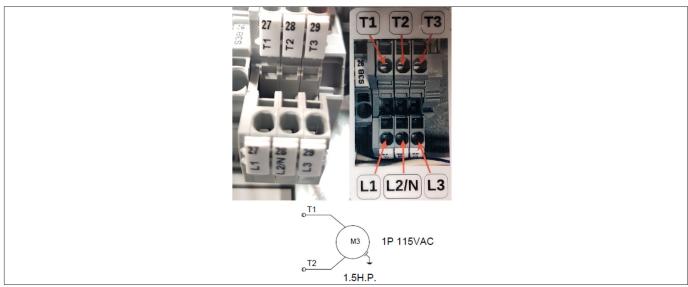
S—AIR BAG DOCK LEVELER MOTOR CONTROL BOX WIRING SCHEMATIC
